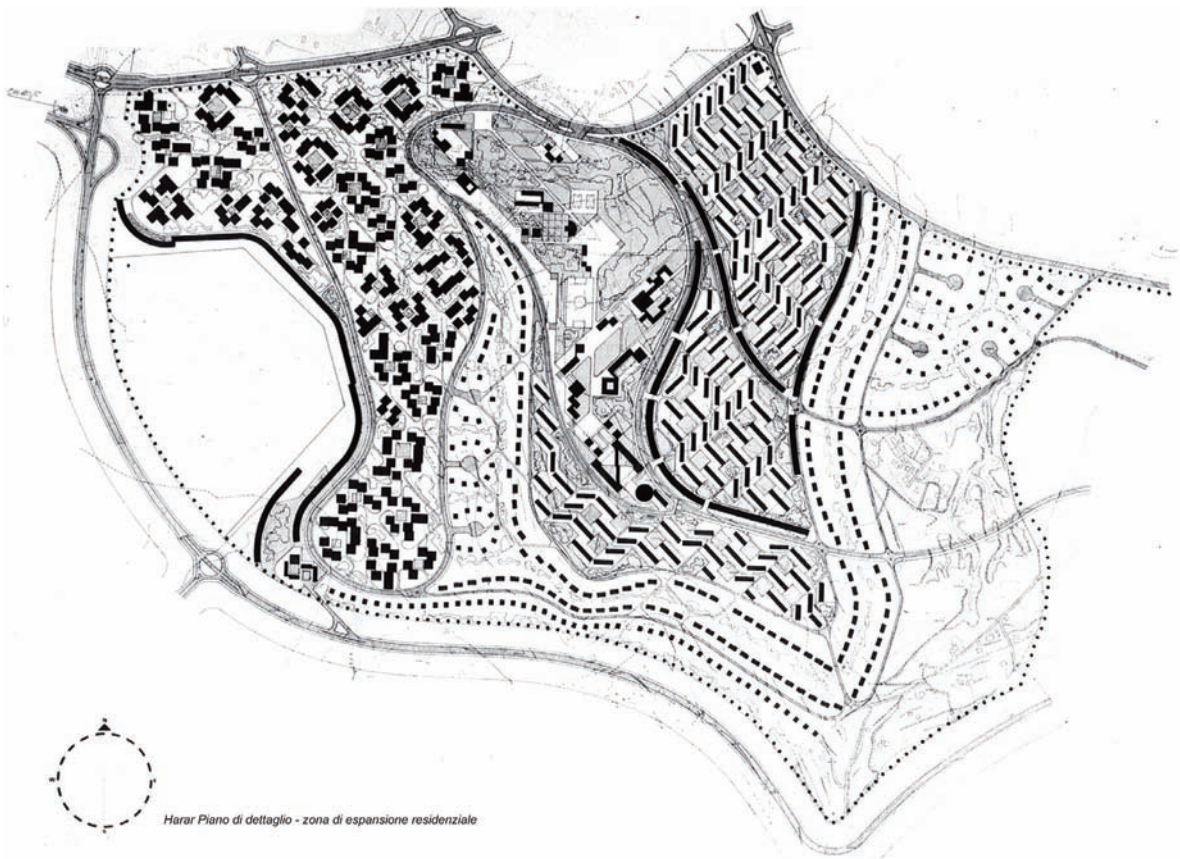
Master plan of Harar, detail plan of the expansion zone for residential use, by Studio BDS, 1967
